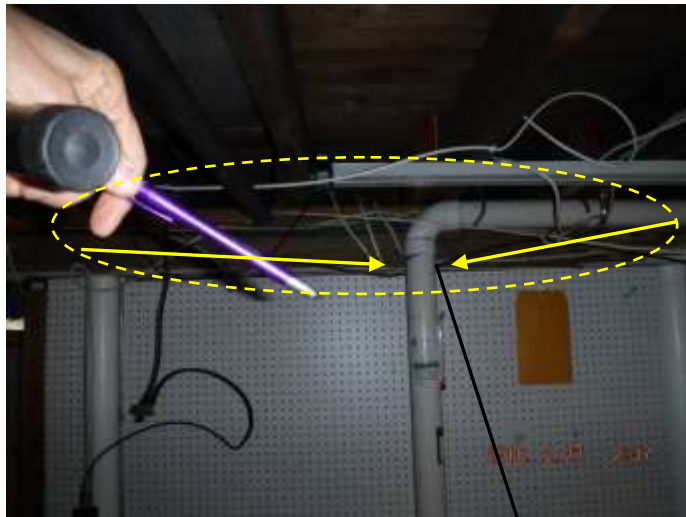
Broken/cracked built up beam on right basement; sloped flooring throughout the home.
